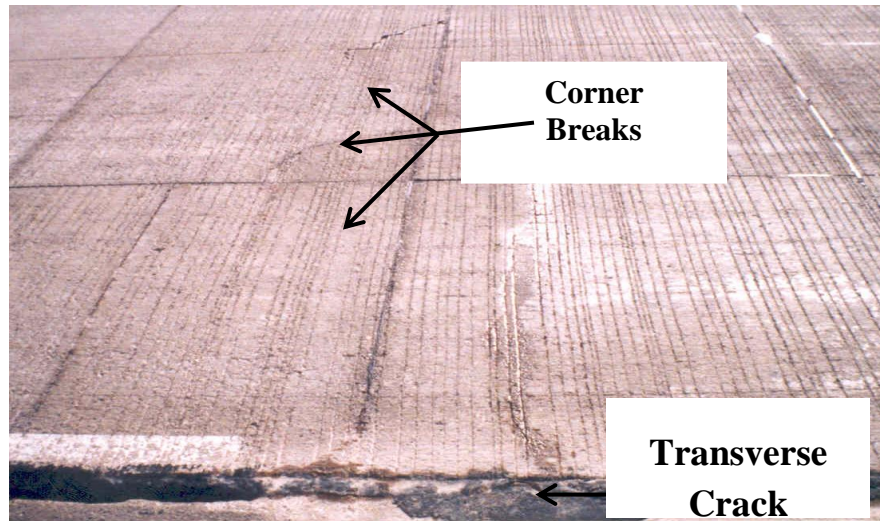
Transverse crack and corner breaks in the Jackson Street test section (03.30.98).
